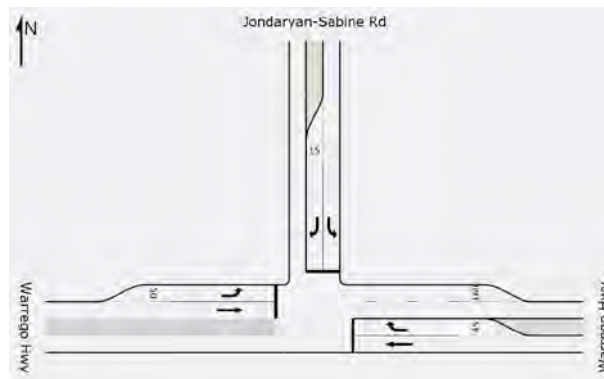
B: Existing intersection layout – Jondaryan Sabine Road/ Warrego Highway
